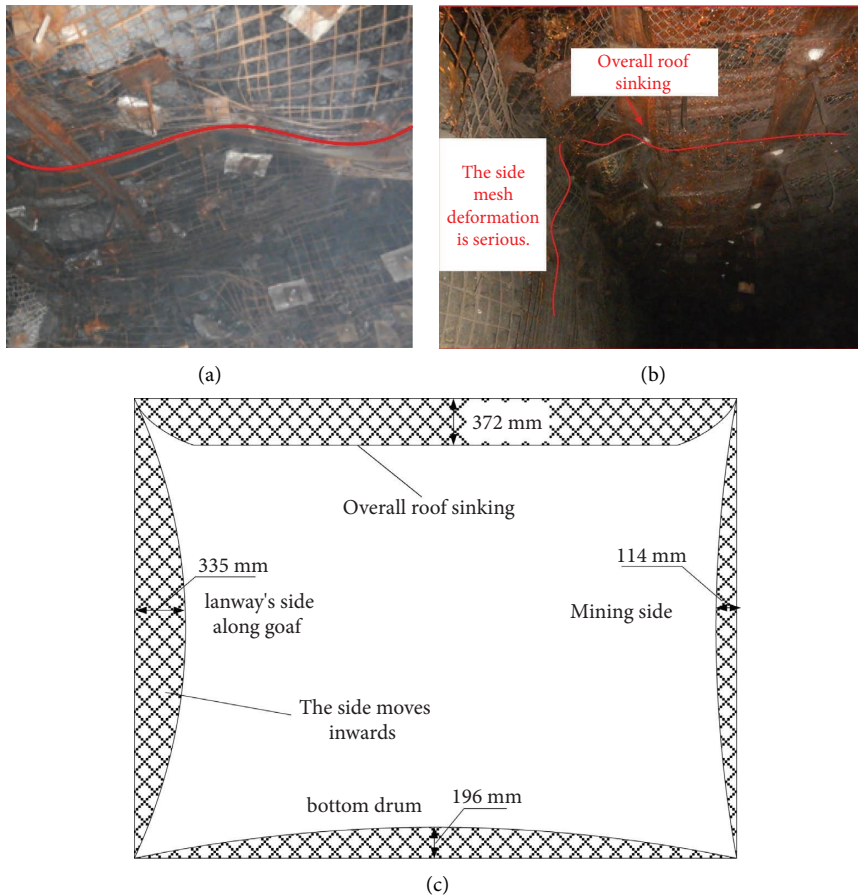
Deformation and failure characteristics of surrounding rock. (a) Roof deformation bolt failure. (b) The overall sinking of the roof and the bulging of the side. (c) Overall deformation and failure of roadway.
